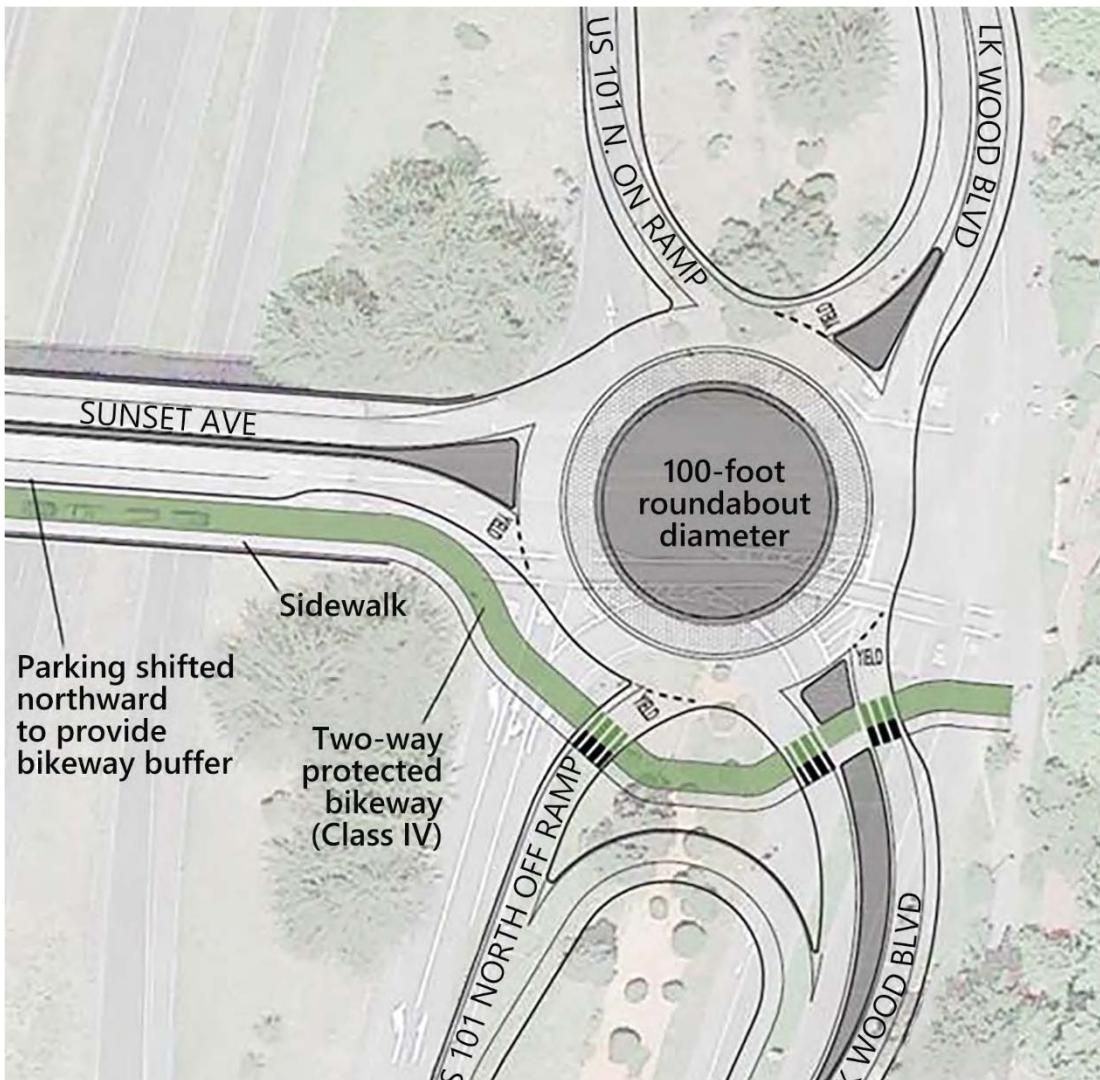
shows the proposed interim plan for the Sunset Avenue and LK Wood Boulevard intersection. If space allows, the right turn from LK Wood Boulevard to Sunset Avenue could be configured to provide additional bikeway setback, per current National Association of City Transportation Officials (NACTO) guidelines.
